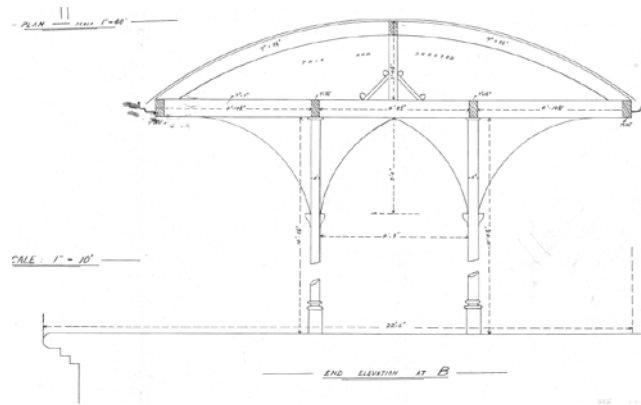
New timber-framed platform awning to the refreshment room. Drawings dated 1925. Source: QLD Rail archive drawing no. K03021
